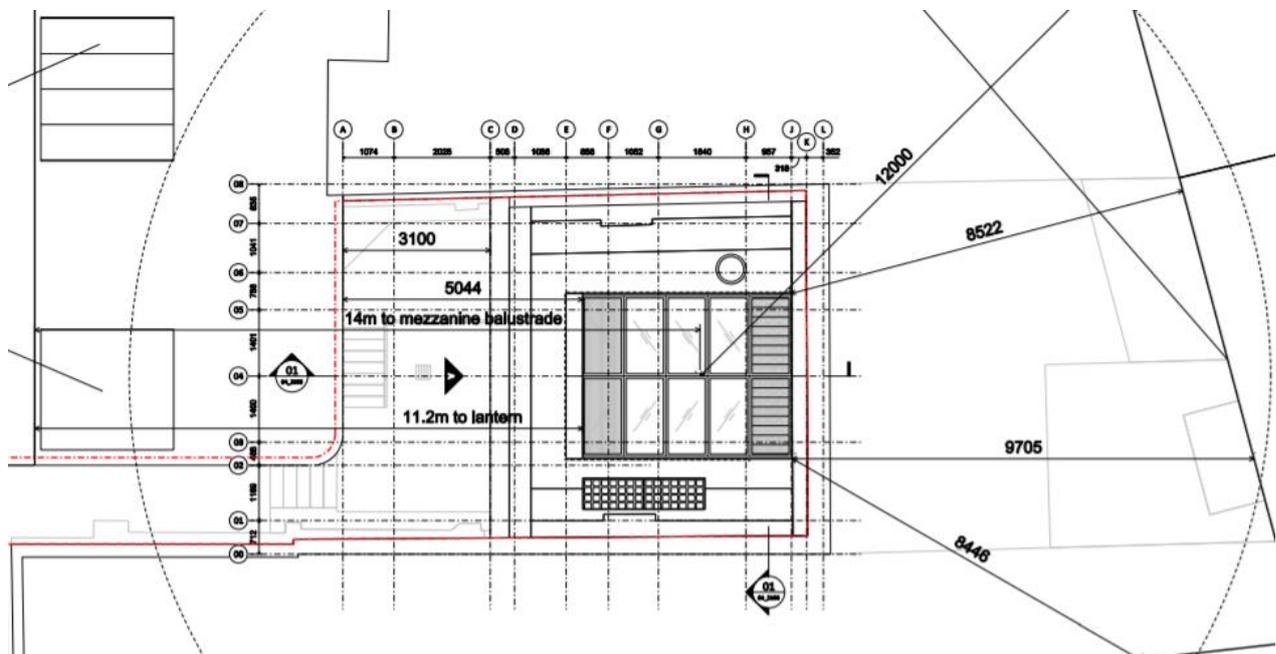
Site plan showing the roof extension and the distances from the rear of the neighbouring properties
